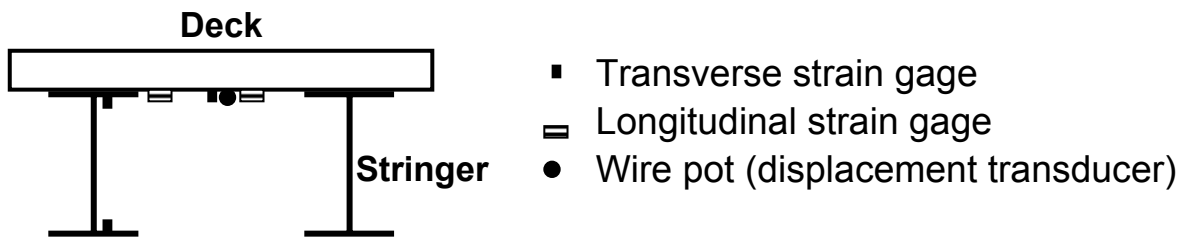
Instrumentation on stringer and deck at location-A & location-B
